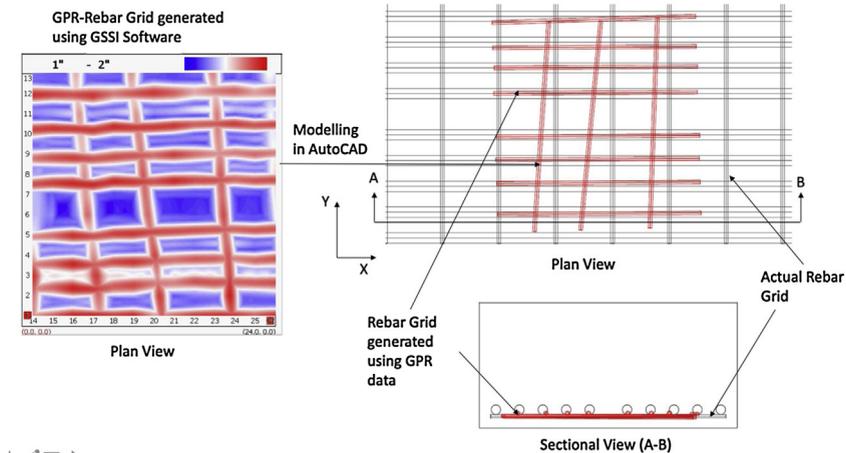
Rebar Grid generated using GPR data (RC Bridge Deck Slab at Site SI-3006A).
